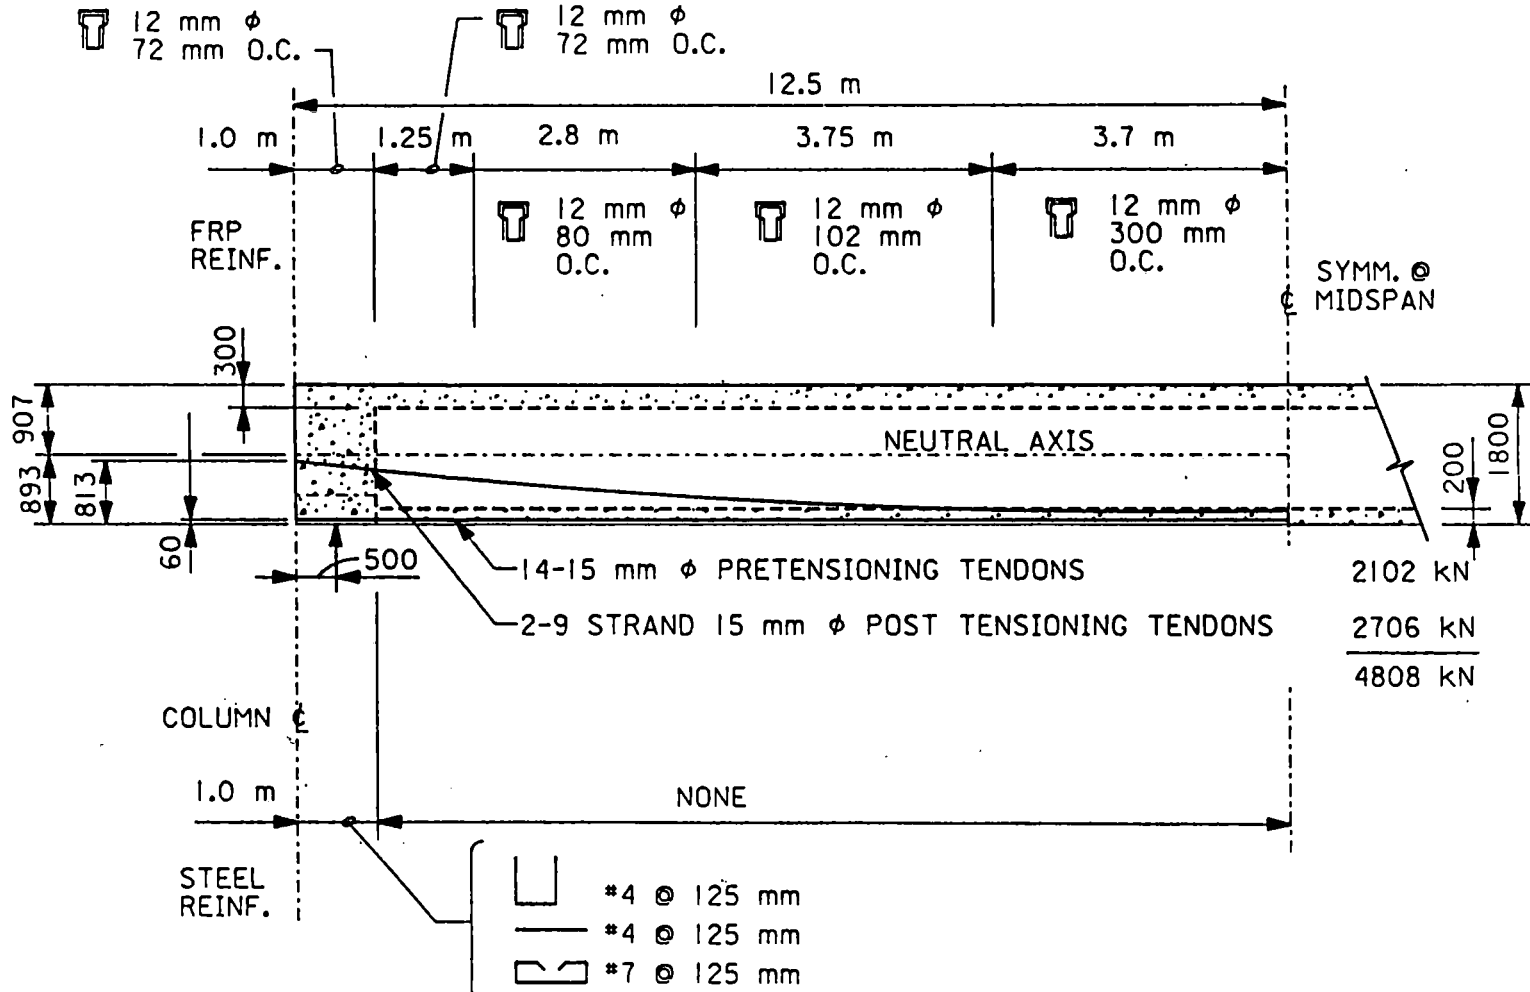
Straight double track girder elevation showing stirrups and tendons
